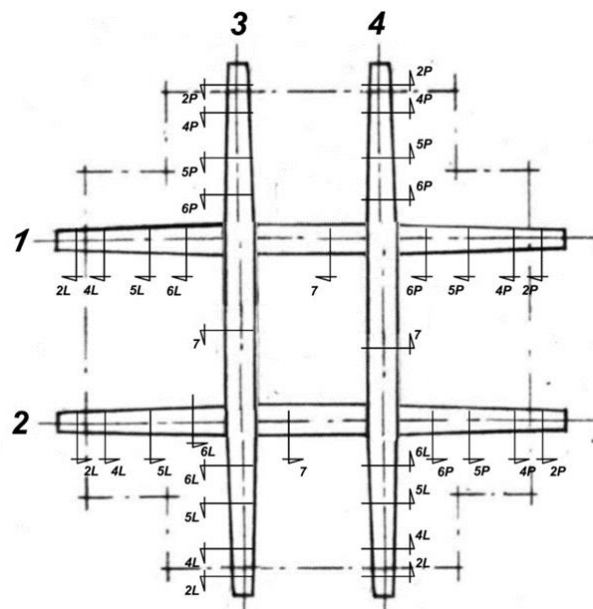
Scheme of the distribution of characteristic cross sections in the tested post-tensioned concrete girders forming the load bearing structure.
